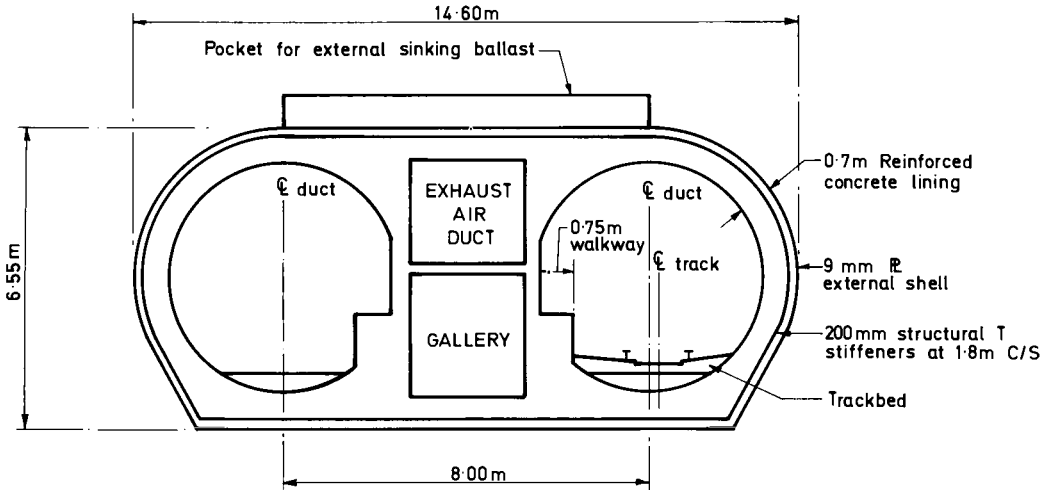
Circular steel shell tunnel (BART Tunnel)
